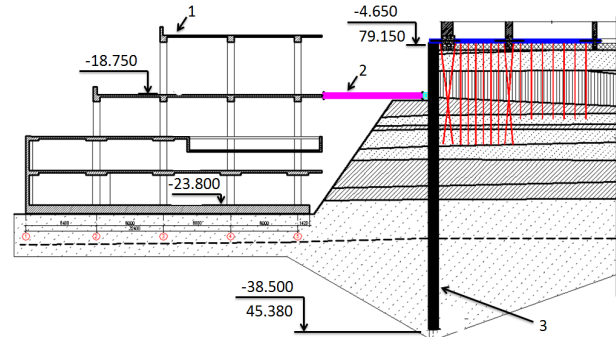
Step-by-step development of berm soil and installation of a strut system for fixing the wall: 1 – new part of the building; 2 – a strut system; 3 – wall in the ground.
